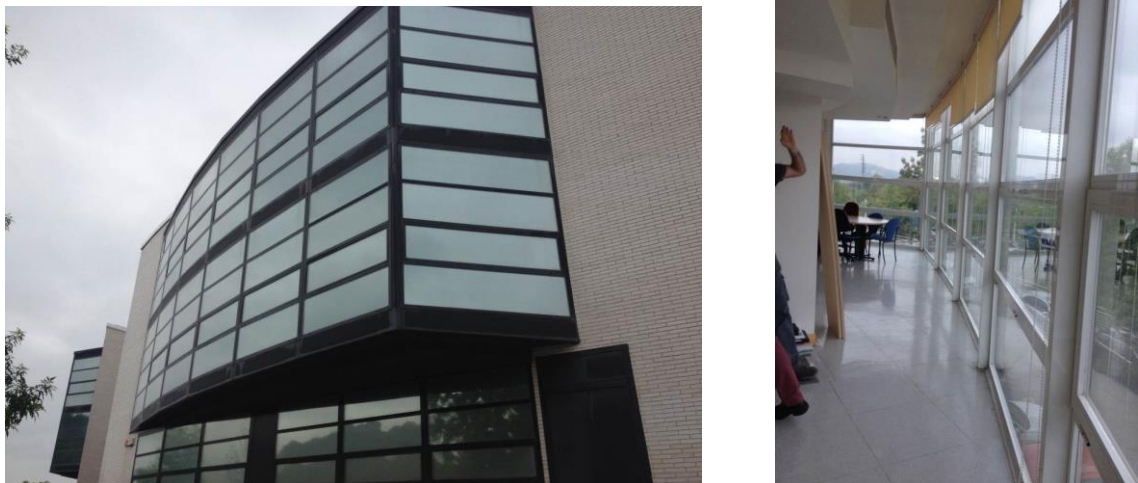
SE Curtain wall where the BIPV system will be installed (left) and room potentially impacted by the BIPV installation
